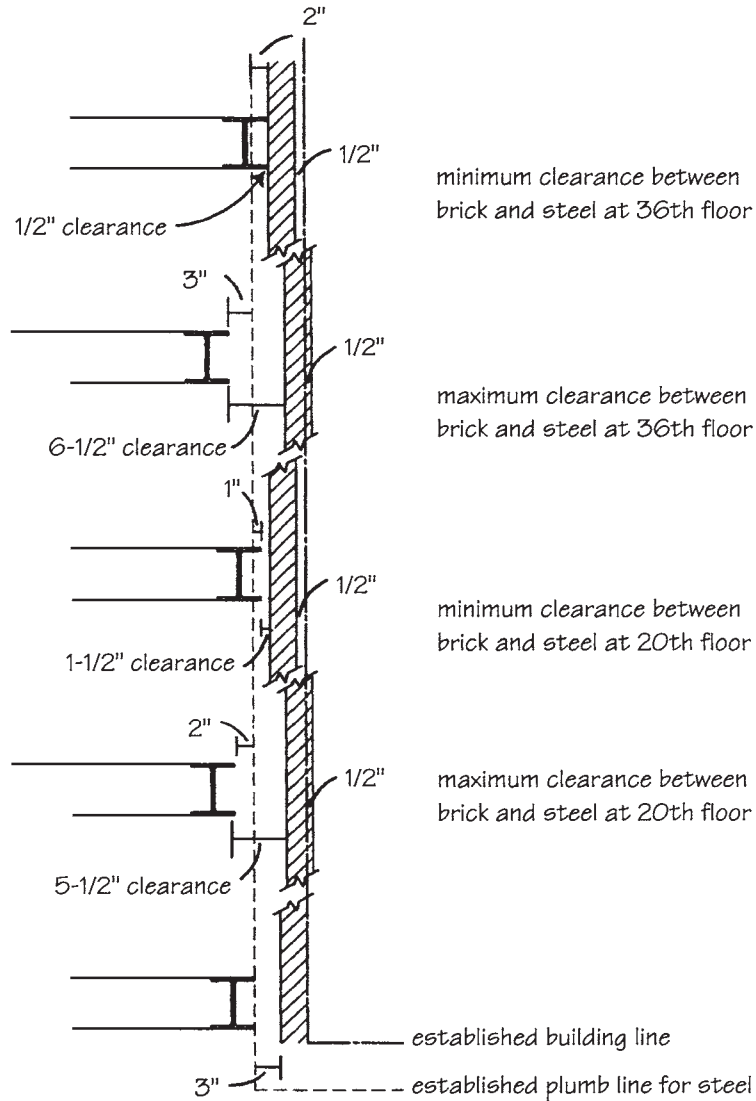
Erection tolerances for steel and concrete structural frames compared to placement tolerances for brick veneer.
